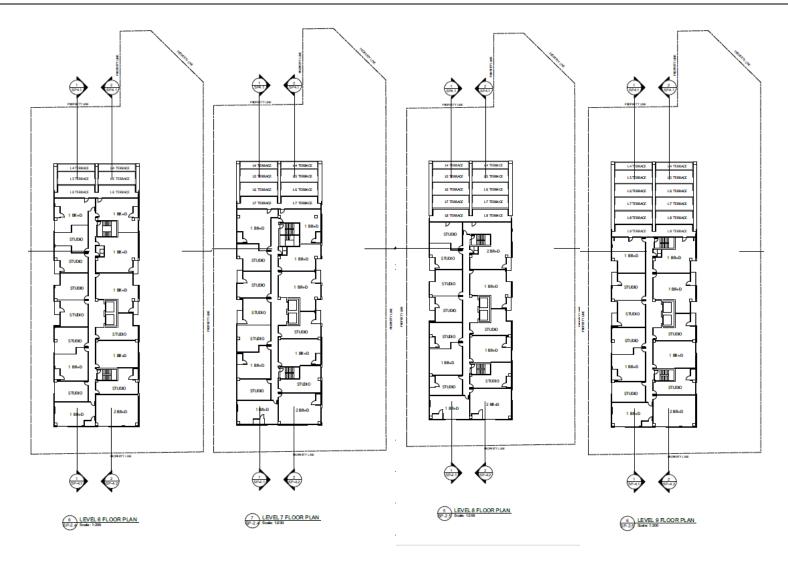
2023 Proposed Development at 6179 Lundy's Lane Floorplans of Floors Six Through Nine (MB1 Urban Planning 2023b)
